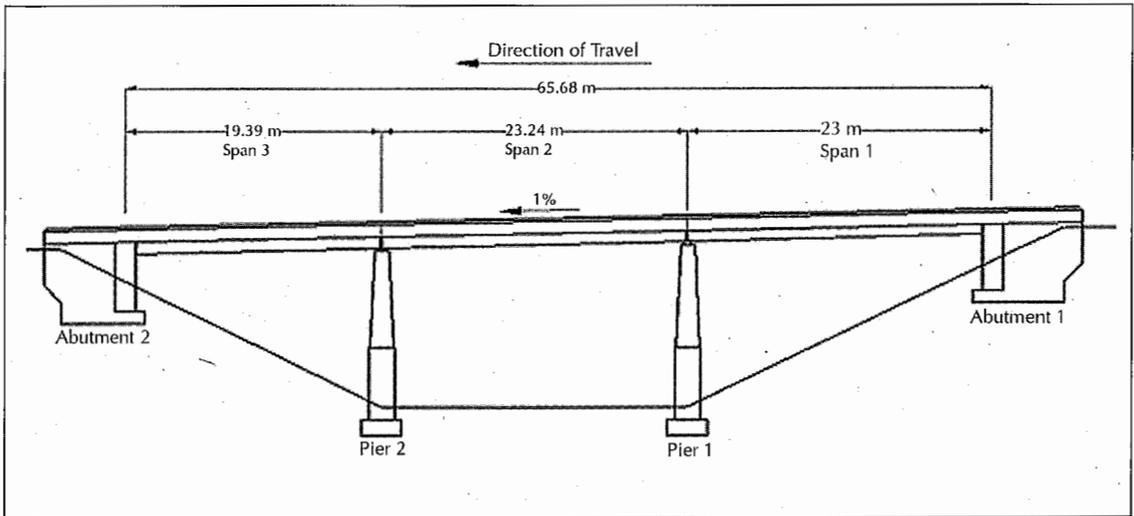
Elevation view of the subject bridge in Connecticut.
